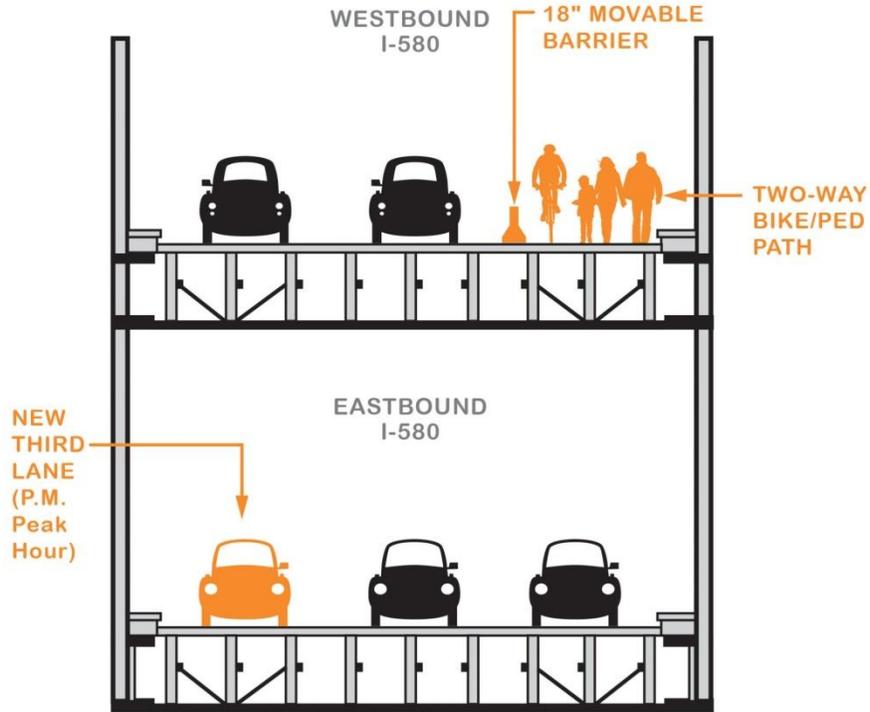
Richmond-San Rafael Bridge Cross Section after improvements, facing west.
